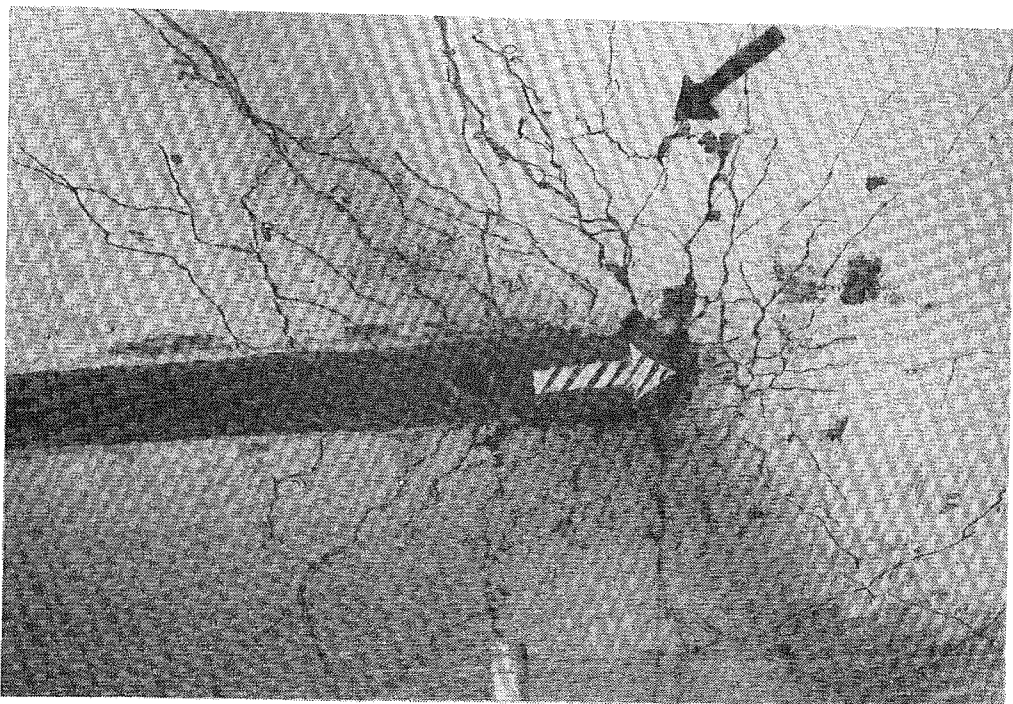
PARTIAL FAILURE OF UNIT 1.
